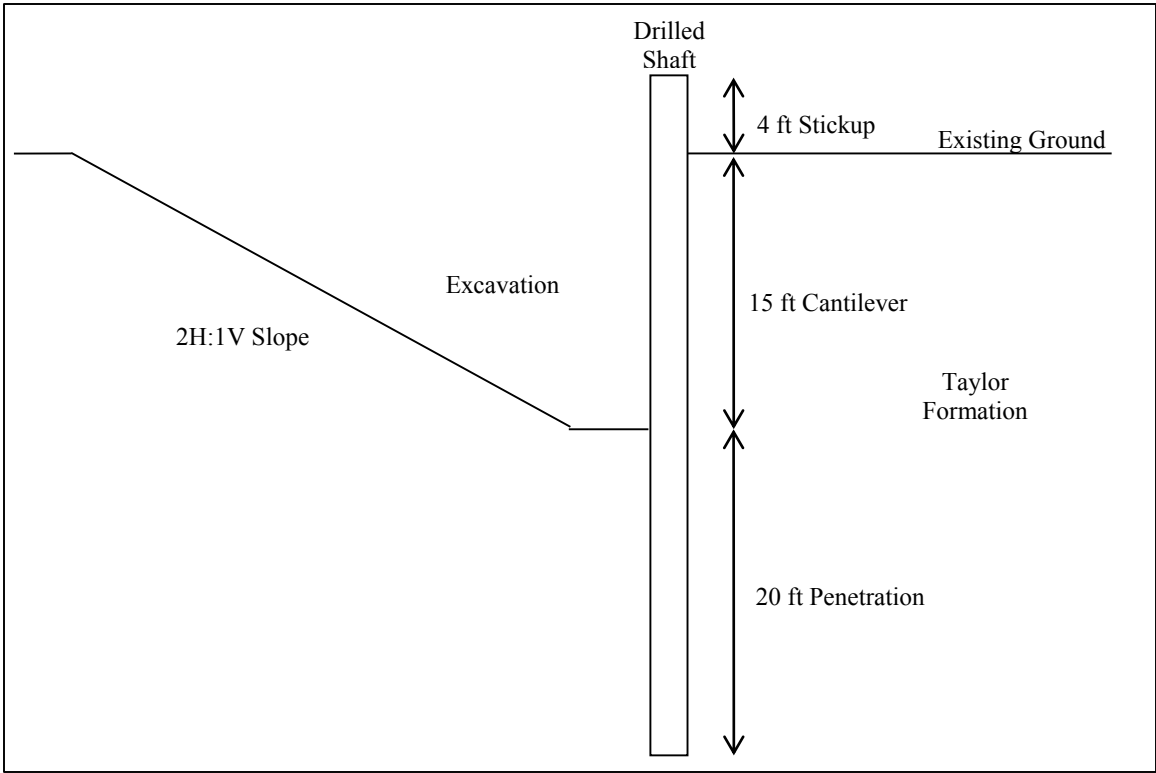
Cross-section of wall and excavation at center shaft, facing east (not to scale).
